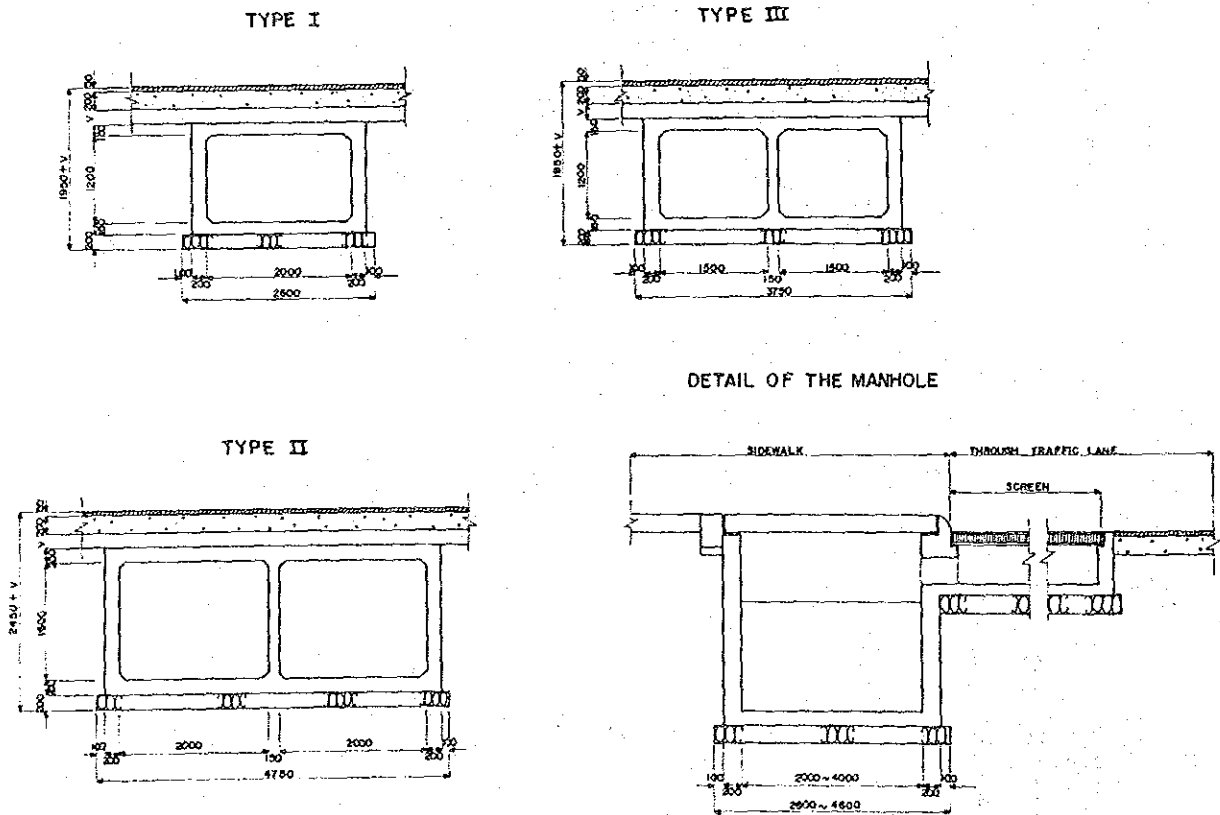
Detail of the Culvert Box and Manhole
